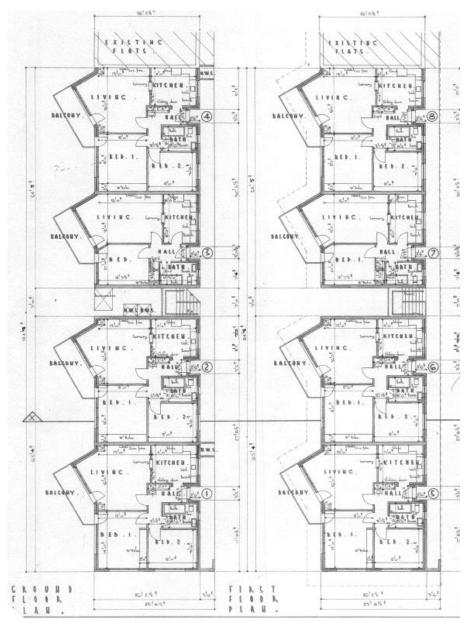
Undated drawings (elevations and plans) relating to building permit 57/131 issued February 1958. (Source: Council Building File)
